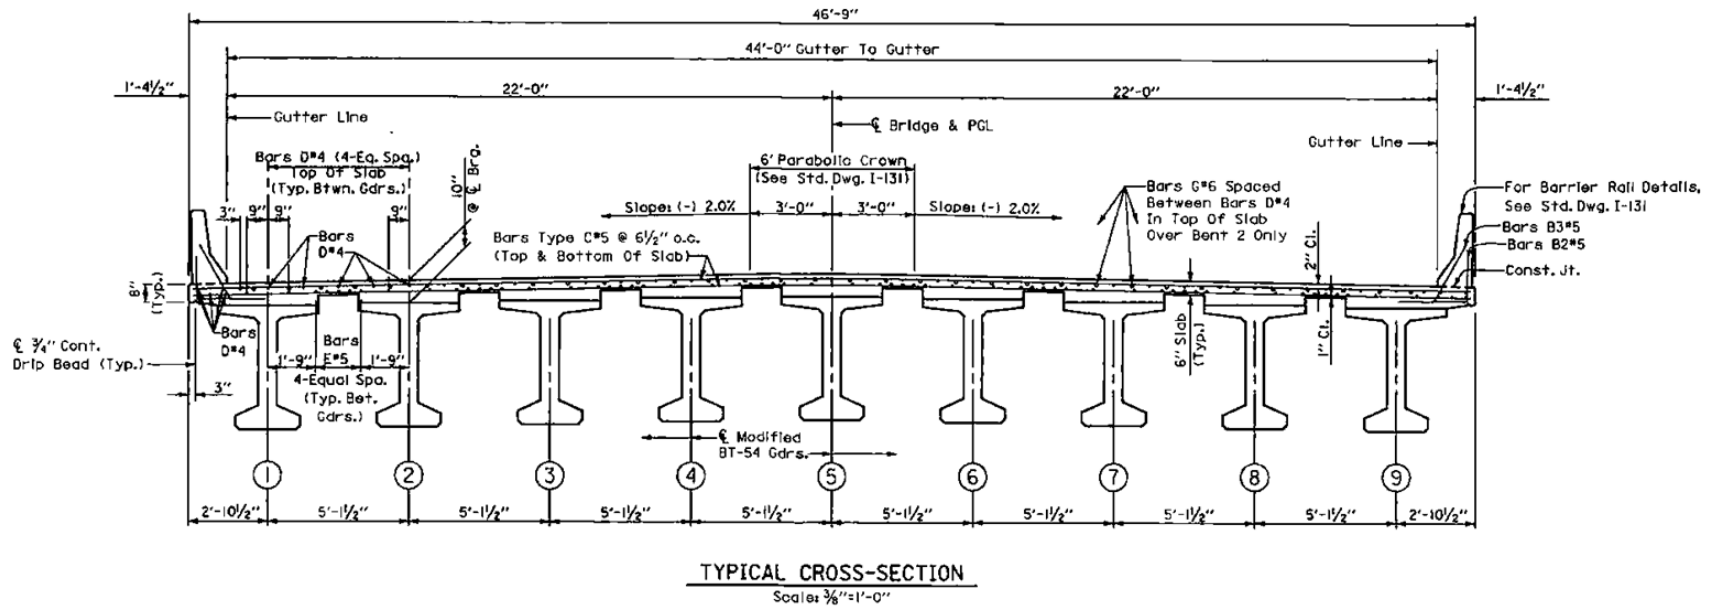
Etowah County typical bridge deck cross section (ALDOT 2011)
